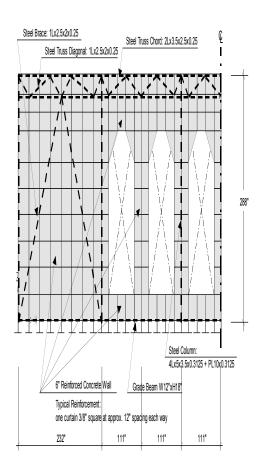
Summary of structural design and dimensions (*RAM Perform* model)
